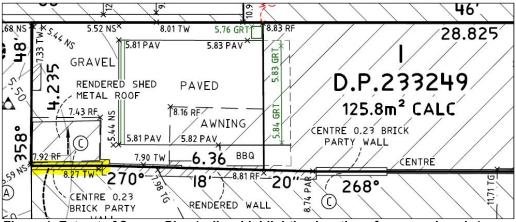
Extract of Survey Plan (yellow highlighting location of proposed works)
